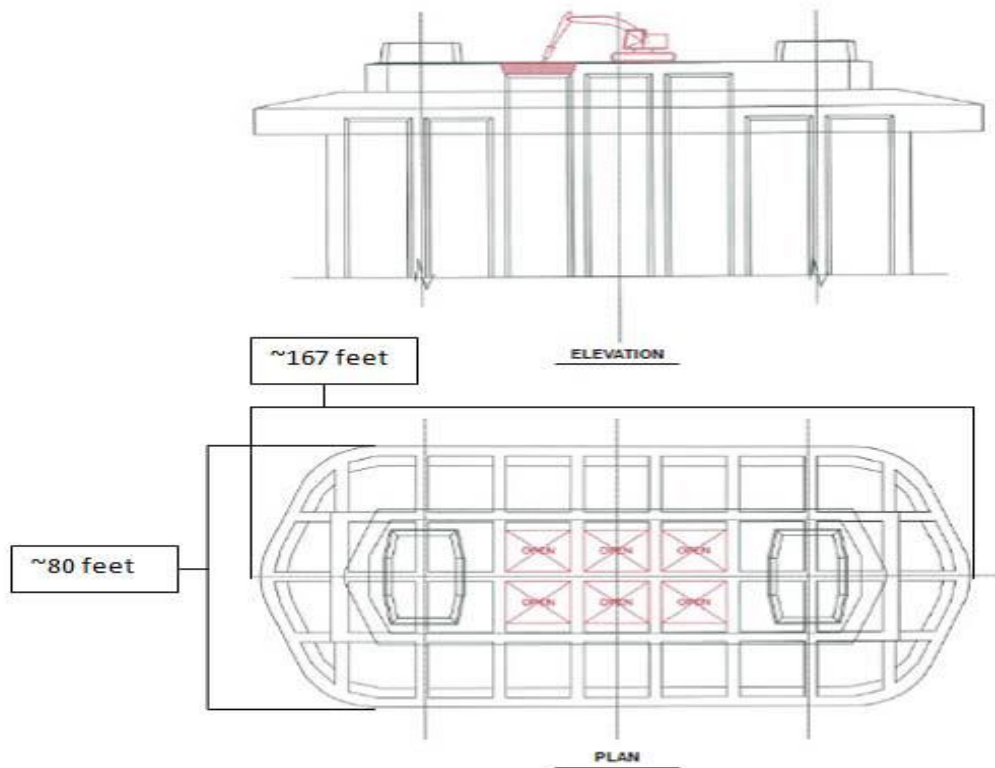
Schematic of Pier E3 elevation view, excavator is shown atop the pier cap removing the top slab of concrete to expose the inner cells of the pier. Exposed inner cells are depicted in the plan view (Caltrans 2015a).
